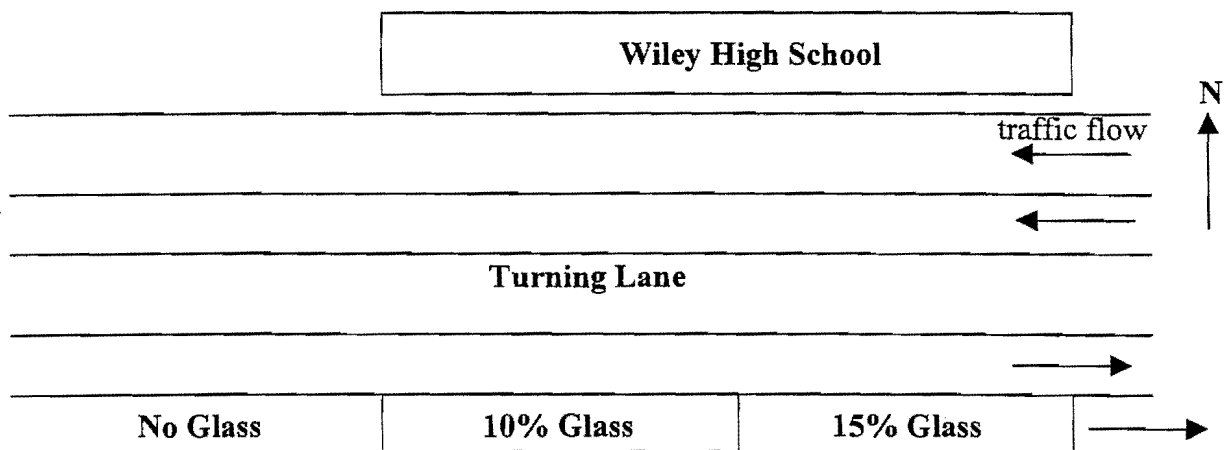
Schematic Drawing of the Test Project #2 Site Location
